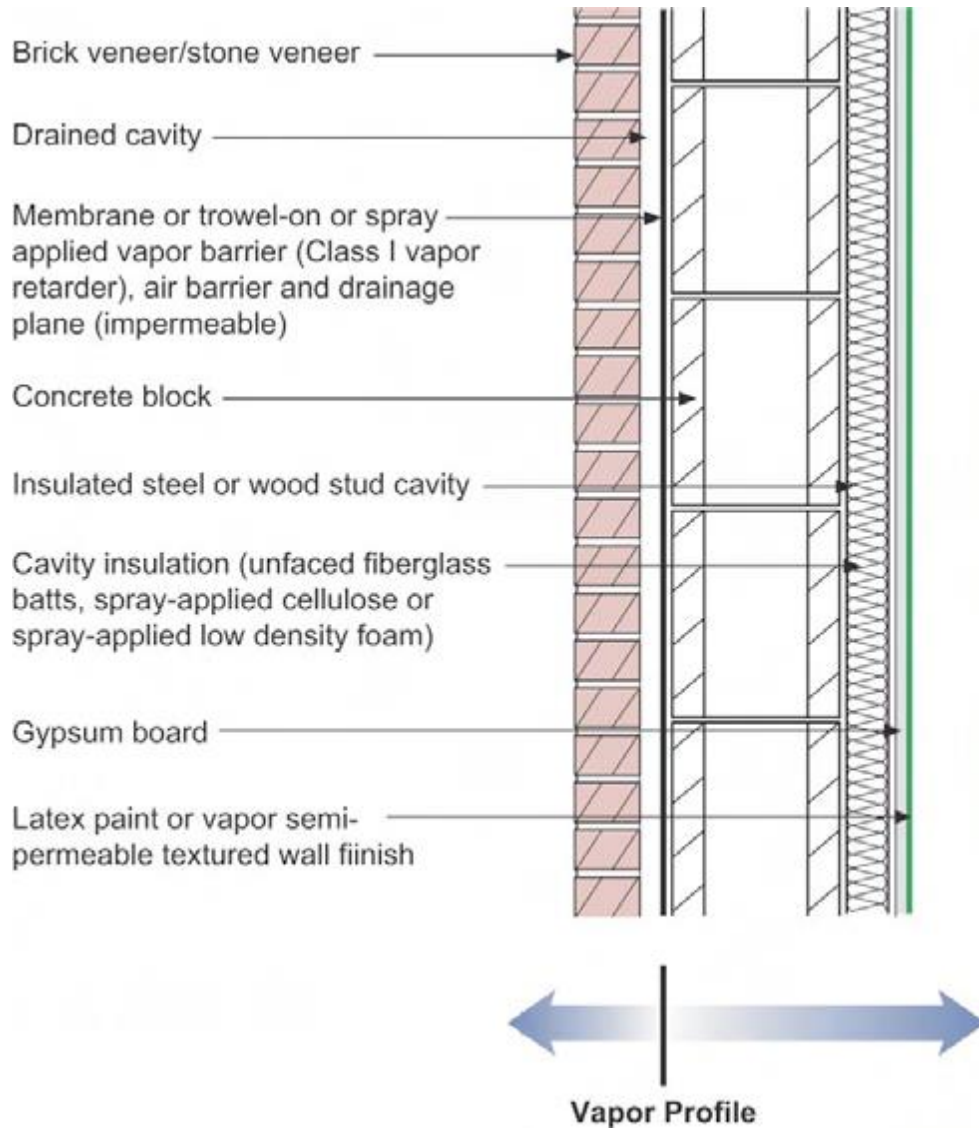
Concrete Block with Interior Frame Wall Cavity Insulation and Brick or Stone Veneer (Joseph, 2005)
